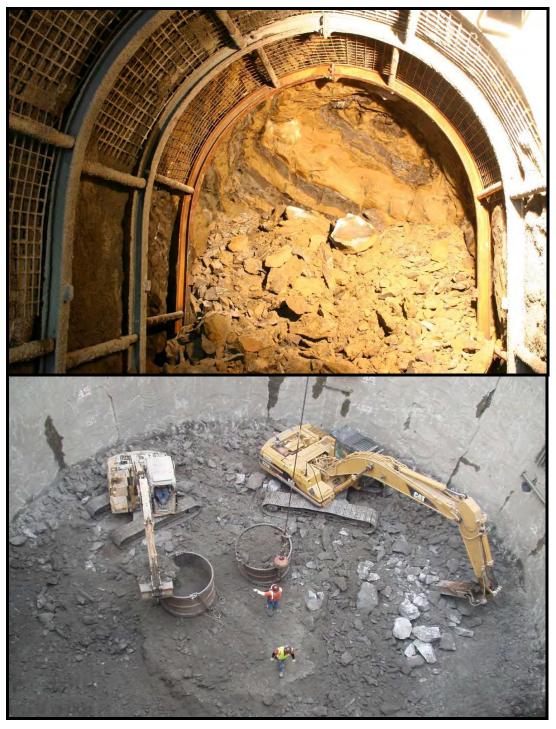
Exposed Face of Puente Formation encountered--when excavating a connector tunnel for a future sewer tie-in on the NEIS project (top). Shaft excavation in the Puente Formation--on the NEIS project (bottom).
